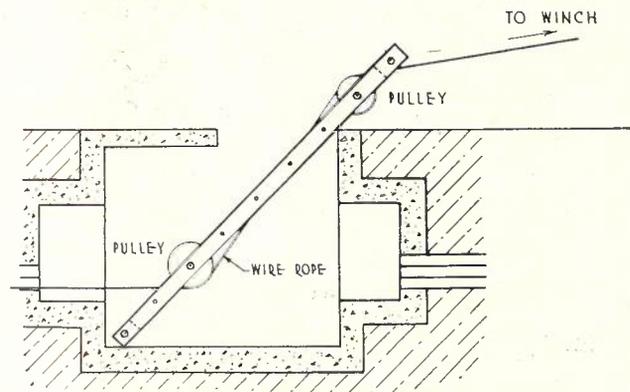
Standard arrangement of fittings in manhole for pulling in cable.
